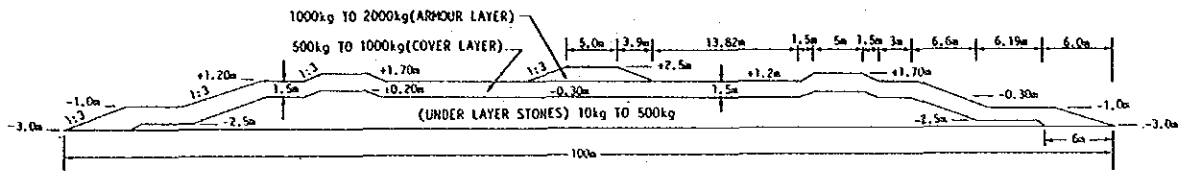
Section of the Breakwater at -3.0m C.D
